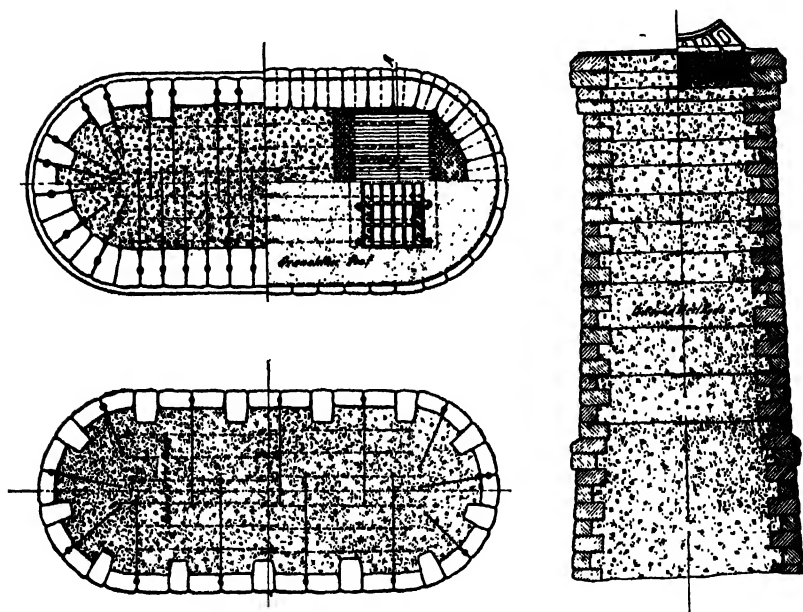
c*.—Cross-section and Plans of Pier 3, Pittsburgh and Lake Erie Railway Bridge over Ohio River, Beaver, Pa.
